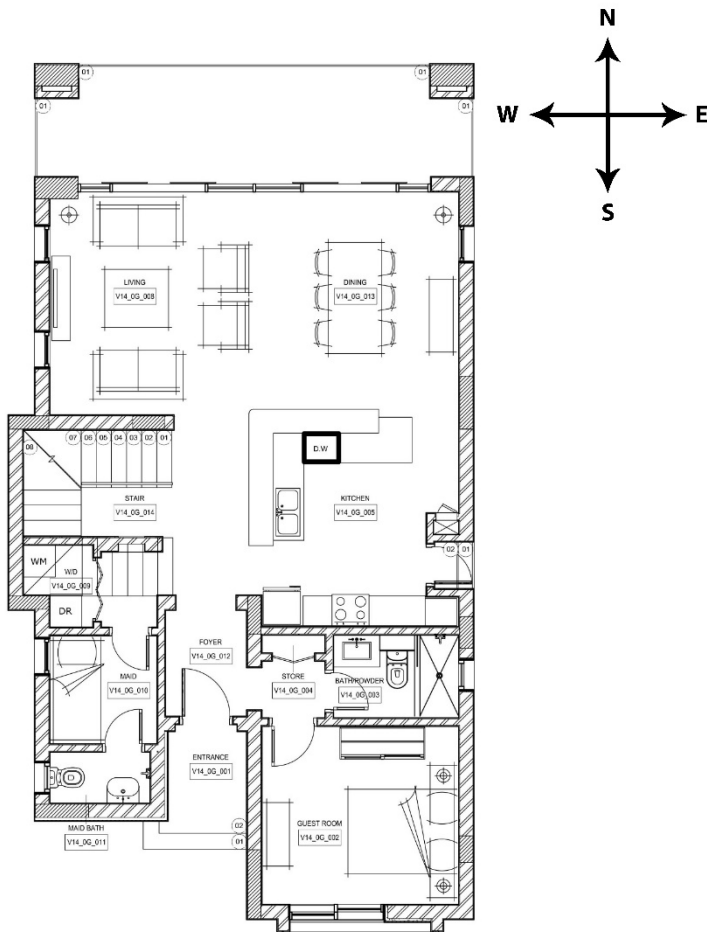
Ground Floor Plan of Villa Type 14 (Emmar Misr for Development, SAE, 2019)
